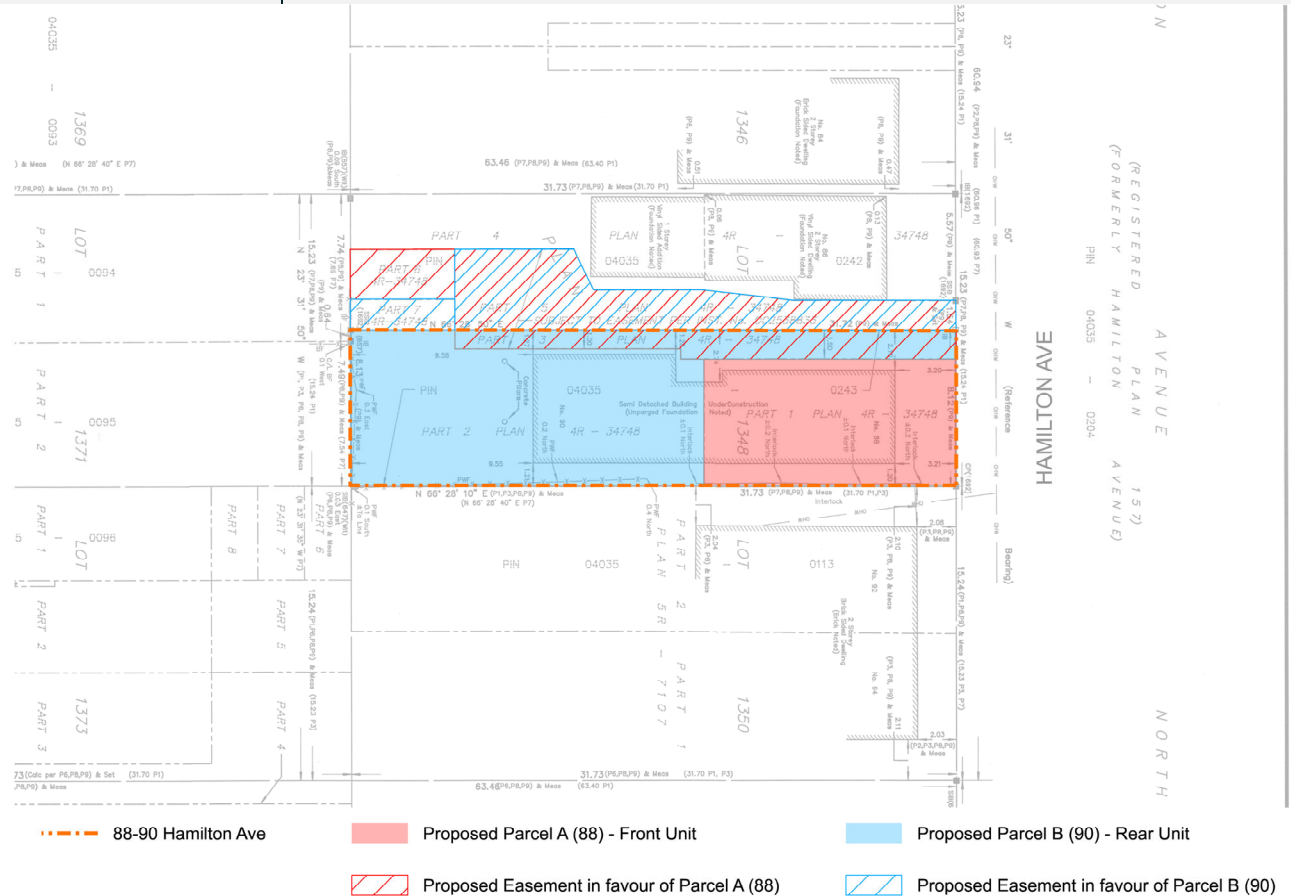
Proposed Severance and Access/Parking Easement (Farley, Smith & Denis Surveying Ltd)
